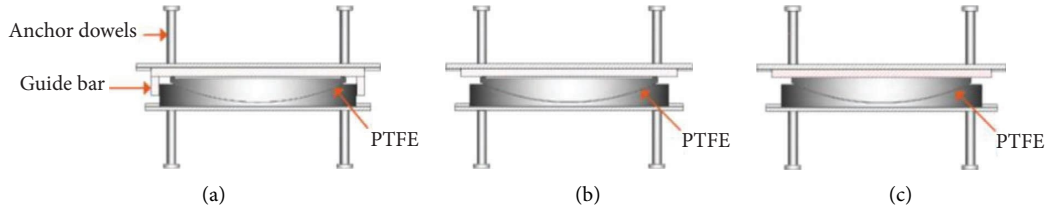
Different types of spherical bearings: (a) guided sliding bearing, (b) free sliding bearing, and (c) fixed bearing.
